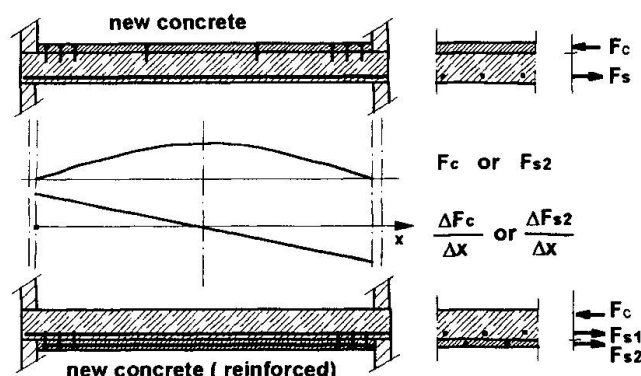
Examples for the method of strengthening. It can work to augment either the flexural compression or tension zones, depending on reinforcement and placement (see Fig. 1).
